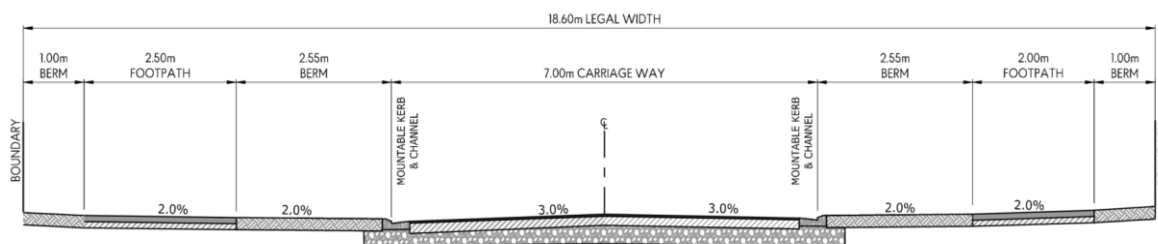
Typical Cross-Section (D) Collector - 18.6m with Berm
